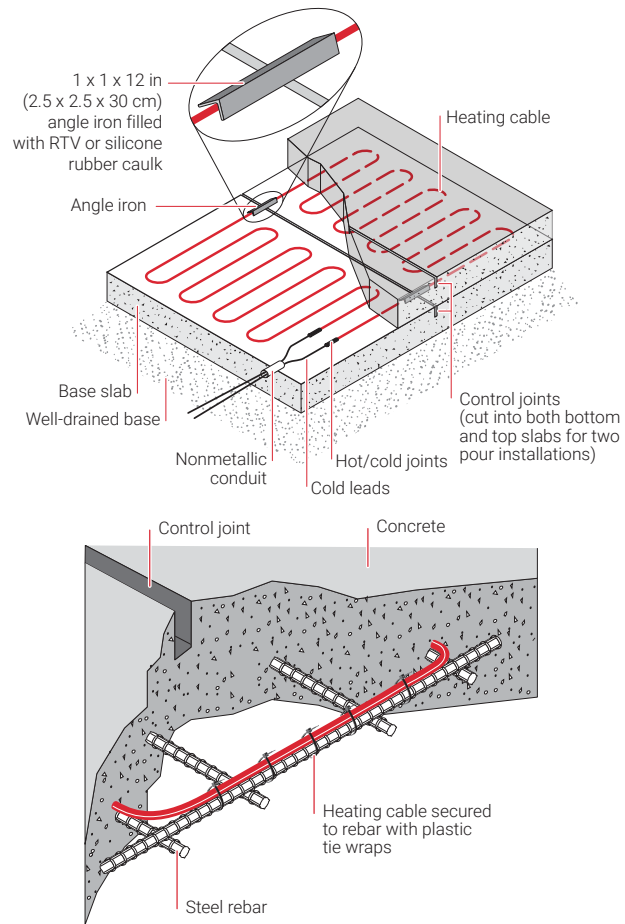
Method of crossing crack-control joints with MI heating cable in concrete slabs
